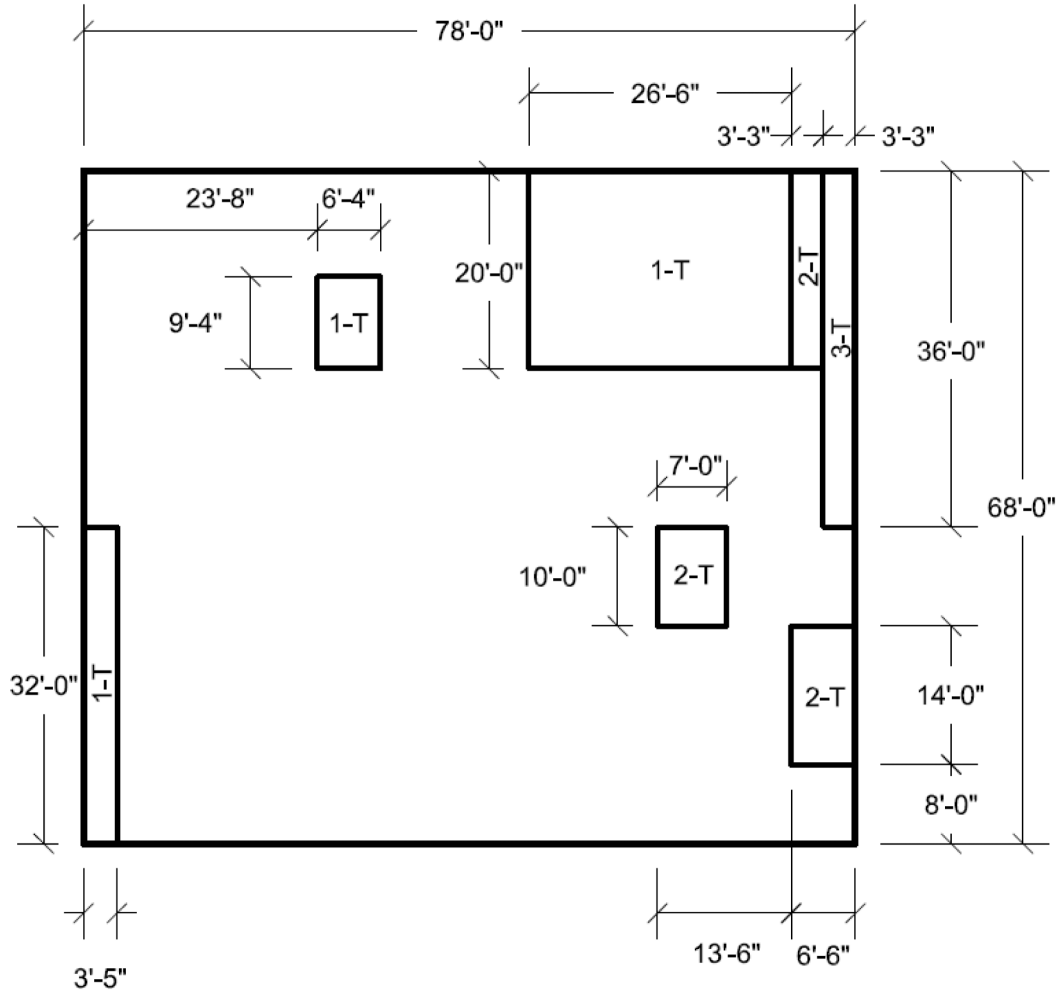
H.6-70 Pump House West Wall Looking East Transverse Reinforcement Zones
